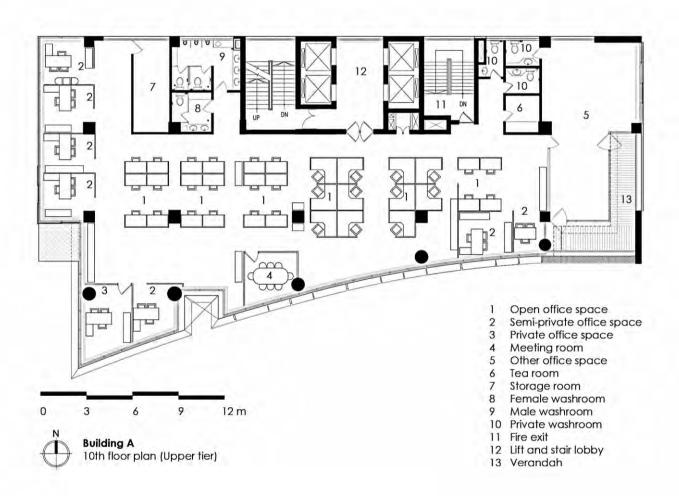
Floor plan of Building A: Upper tier (Source: Building A contractor, edited by author)
